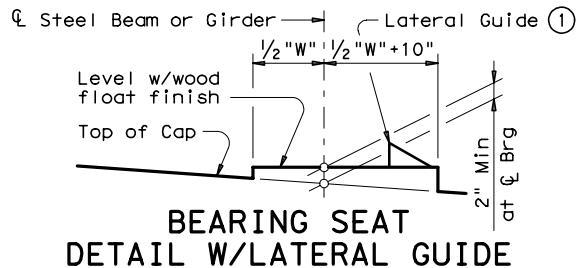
Typical Bearing Seat Plan Views for (IE) Bearings. Online users can click 6-14 to view this illustration in PDF.
